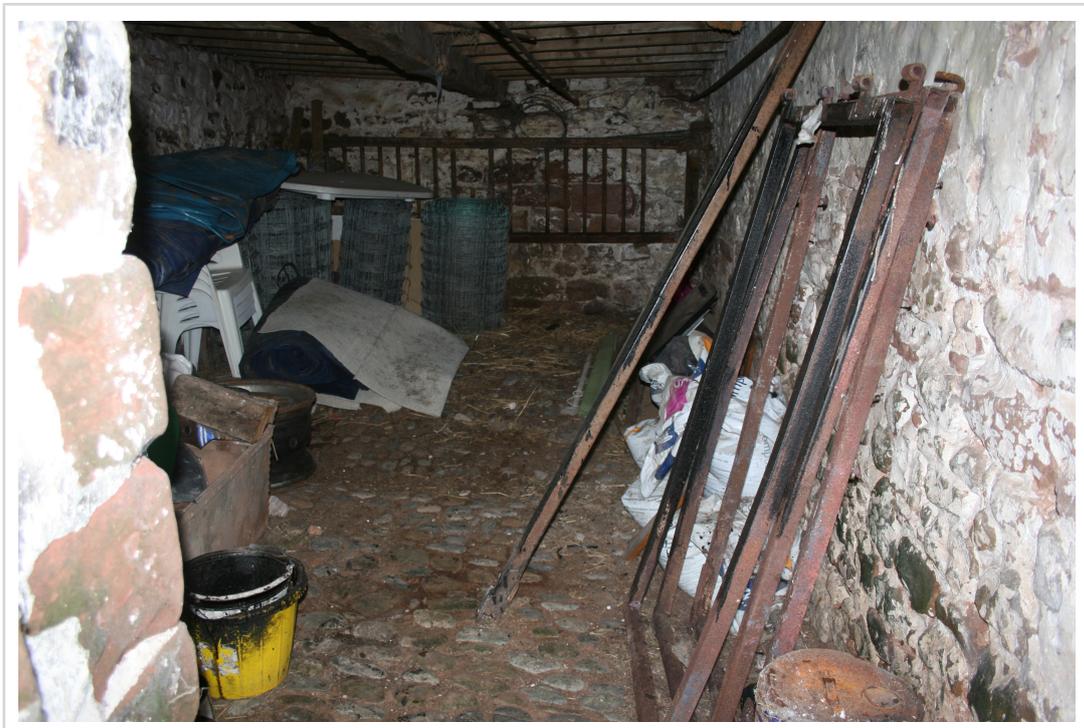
Loose Box showing Cobbled Floor and Hay Rack
